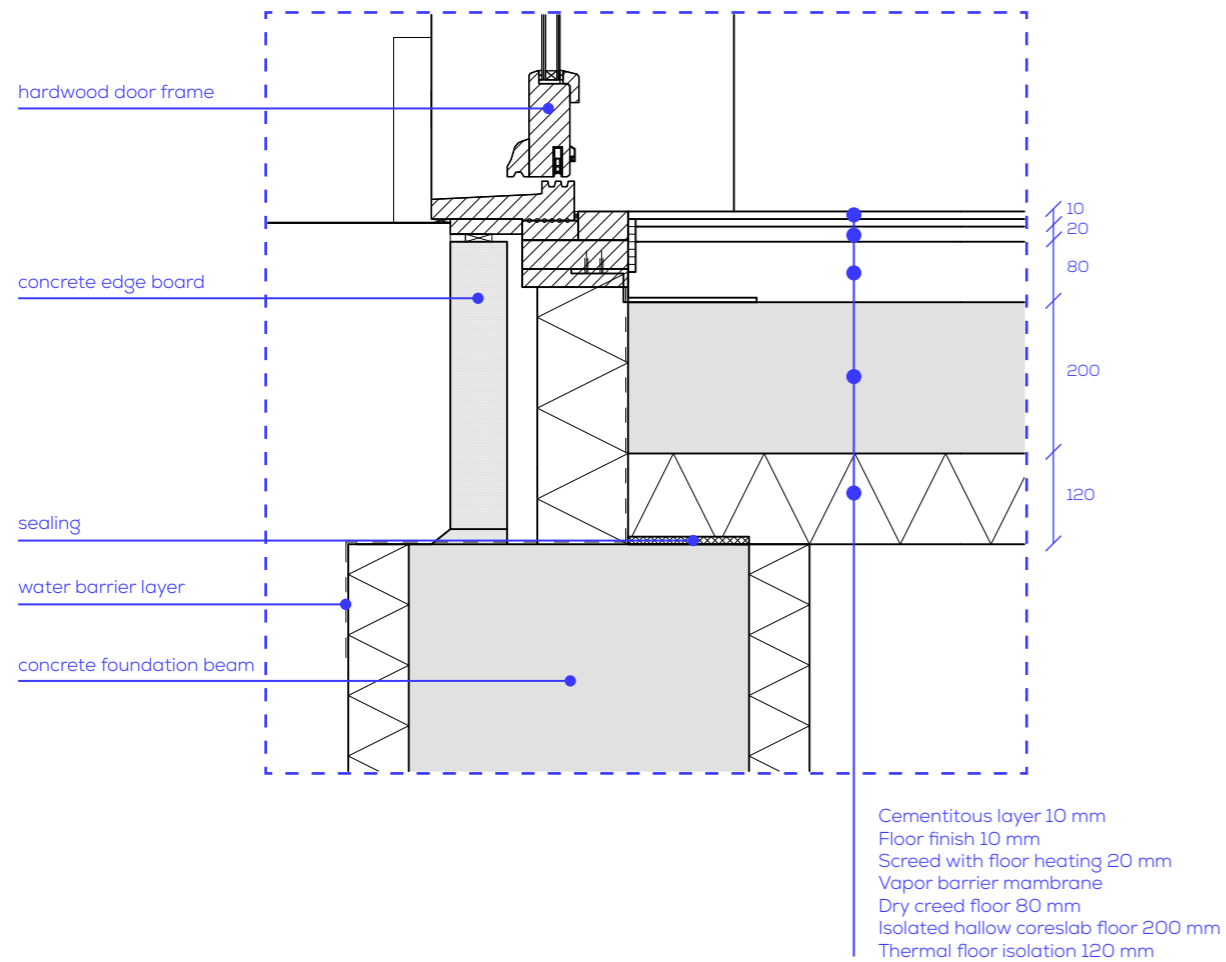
Vertical window detail V.005, drawn on scale 1:5, scaled to 1:10
